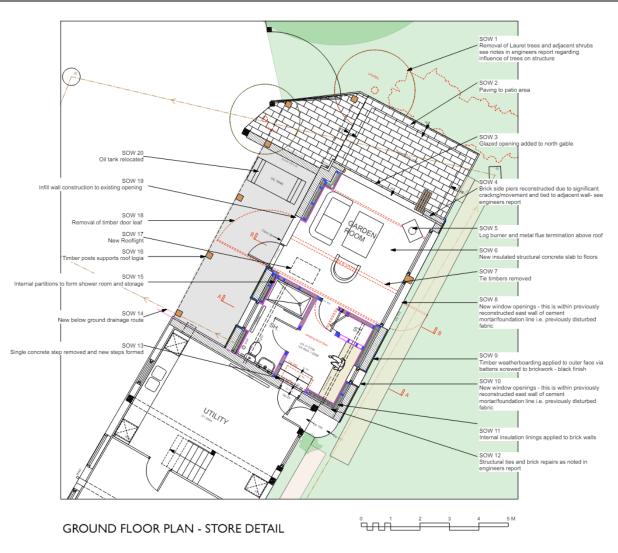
Proposed site plan. Created using drawing no.05 PROPOSED GA PLAN produced and copyrighted by Beech Architects Ltd. Beech Architects have given full permission for the replication of their work.
